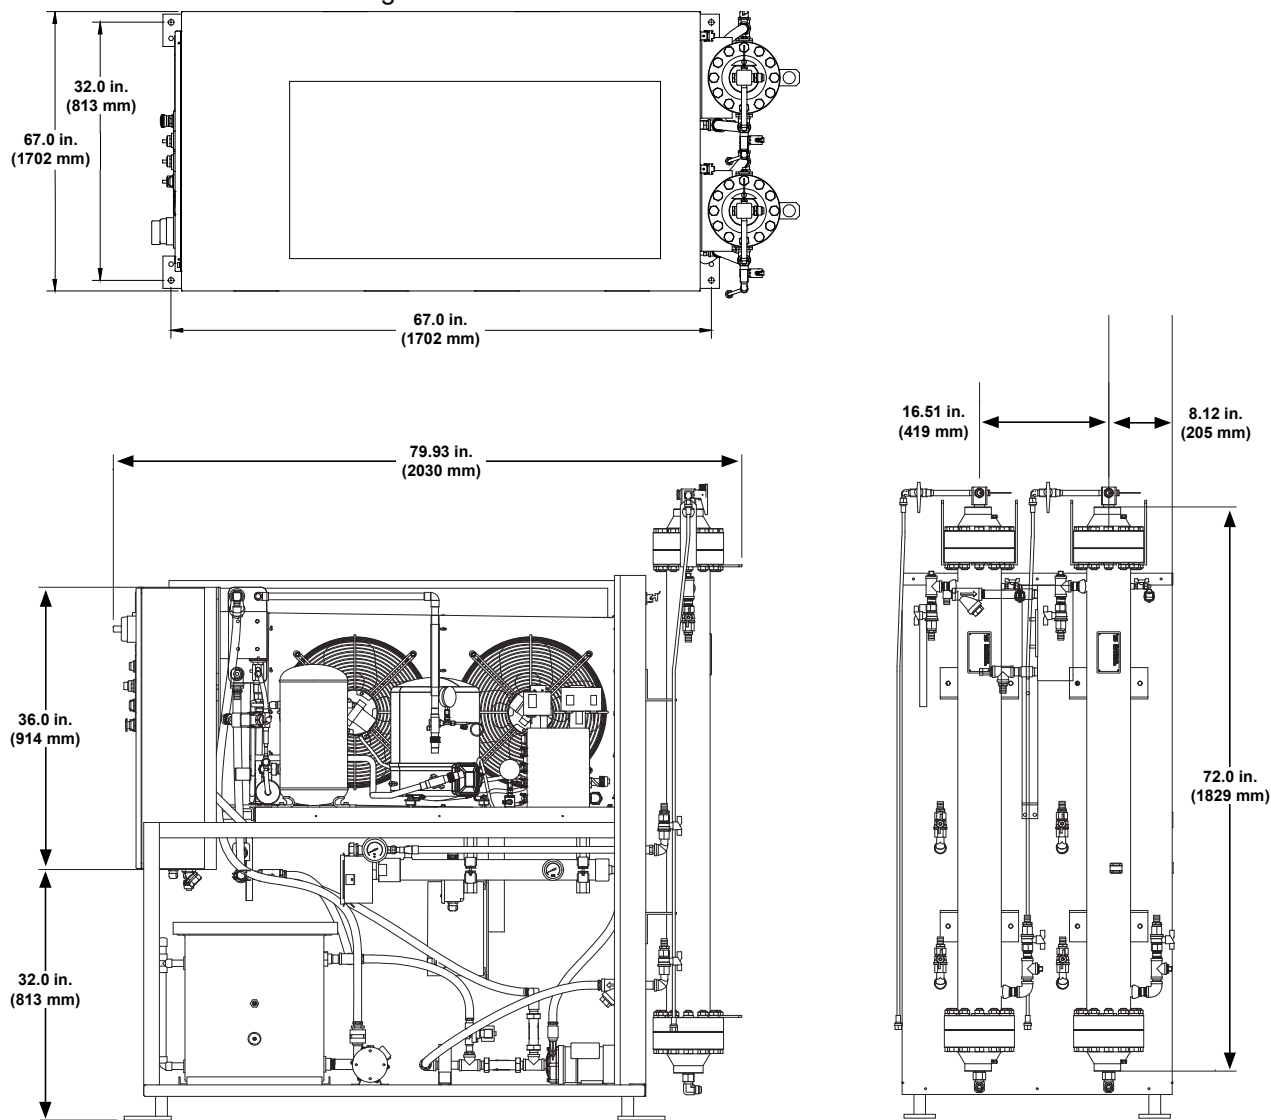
Dual-Air Cooling System With Heat Exchanger Dimensions
